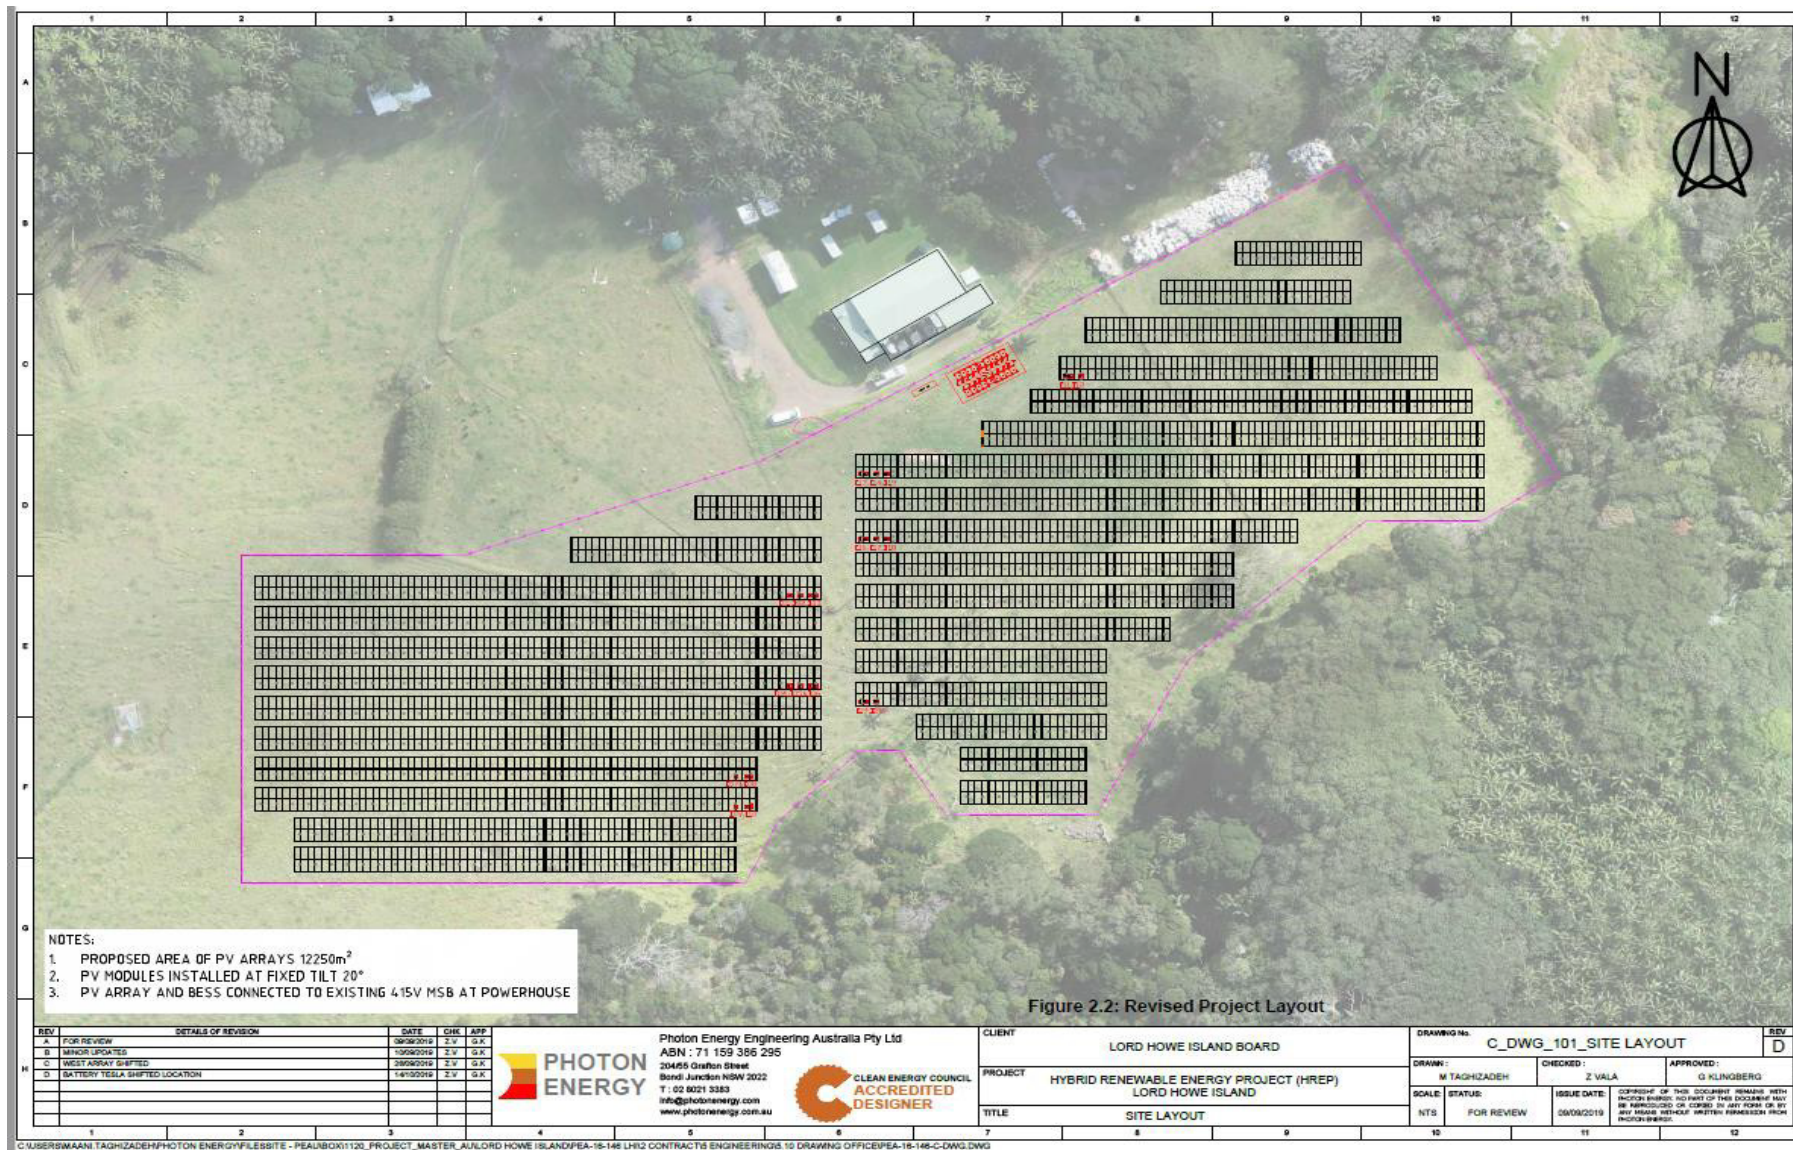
Revised LHI Solar Photovoltaic Project Site Plan with System and Generator layout
